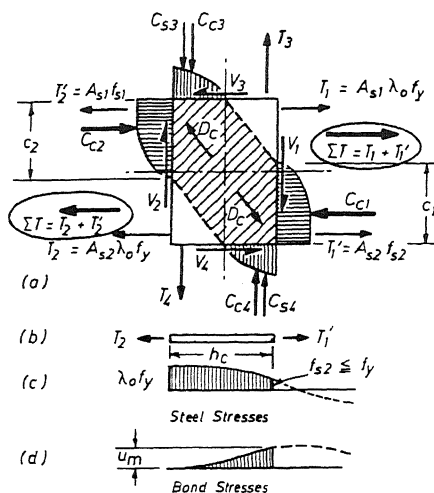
Redistribution of Internal Beam Forces Resulting from the Breakdown of Bond Strength in a Joint.
